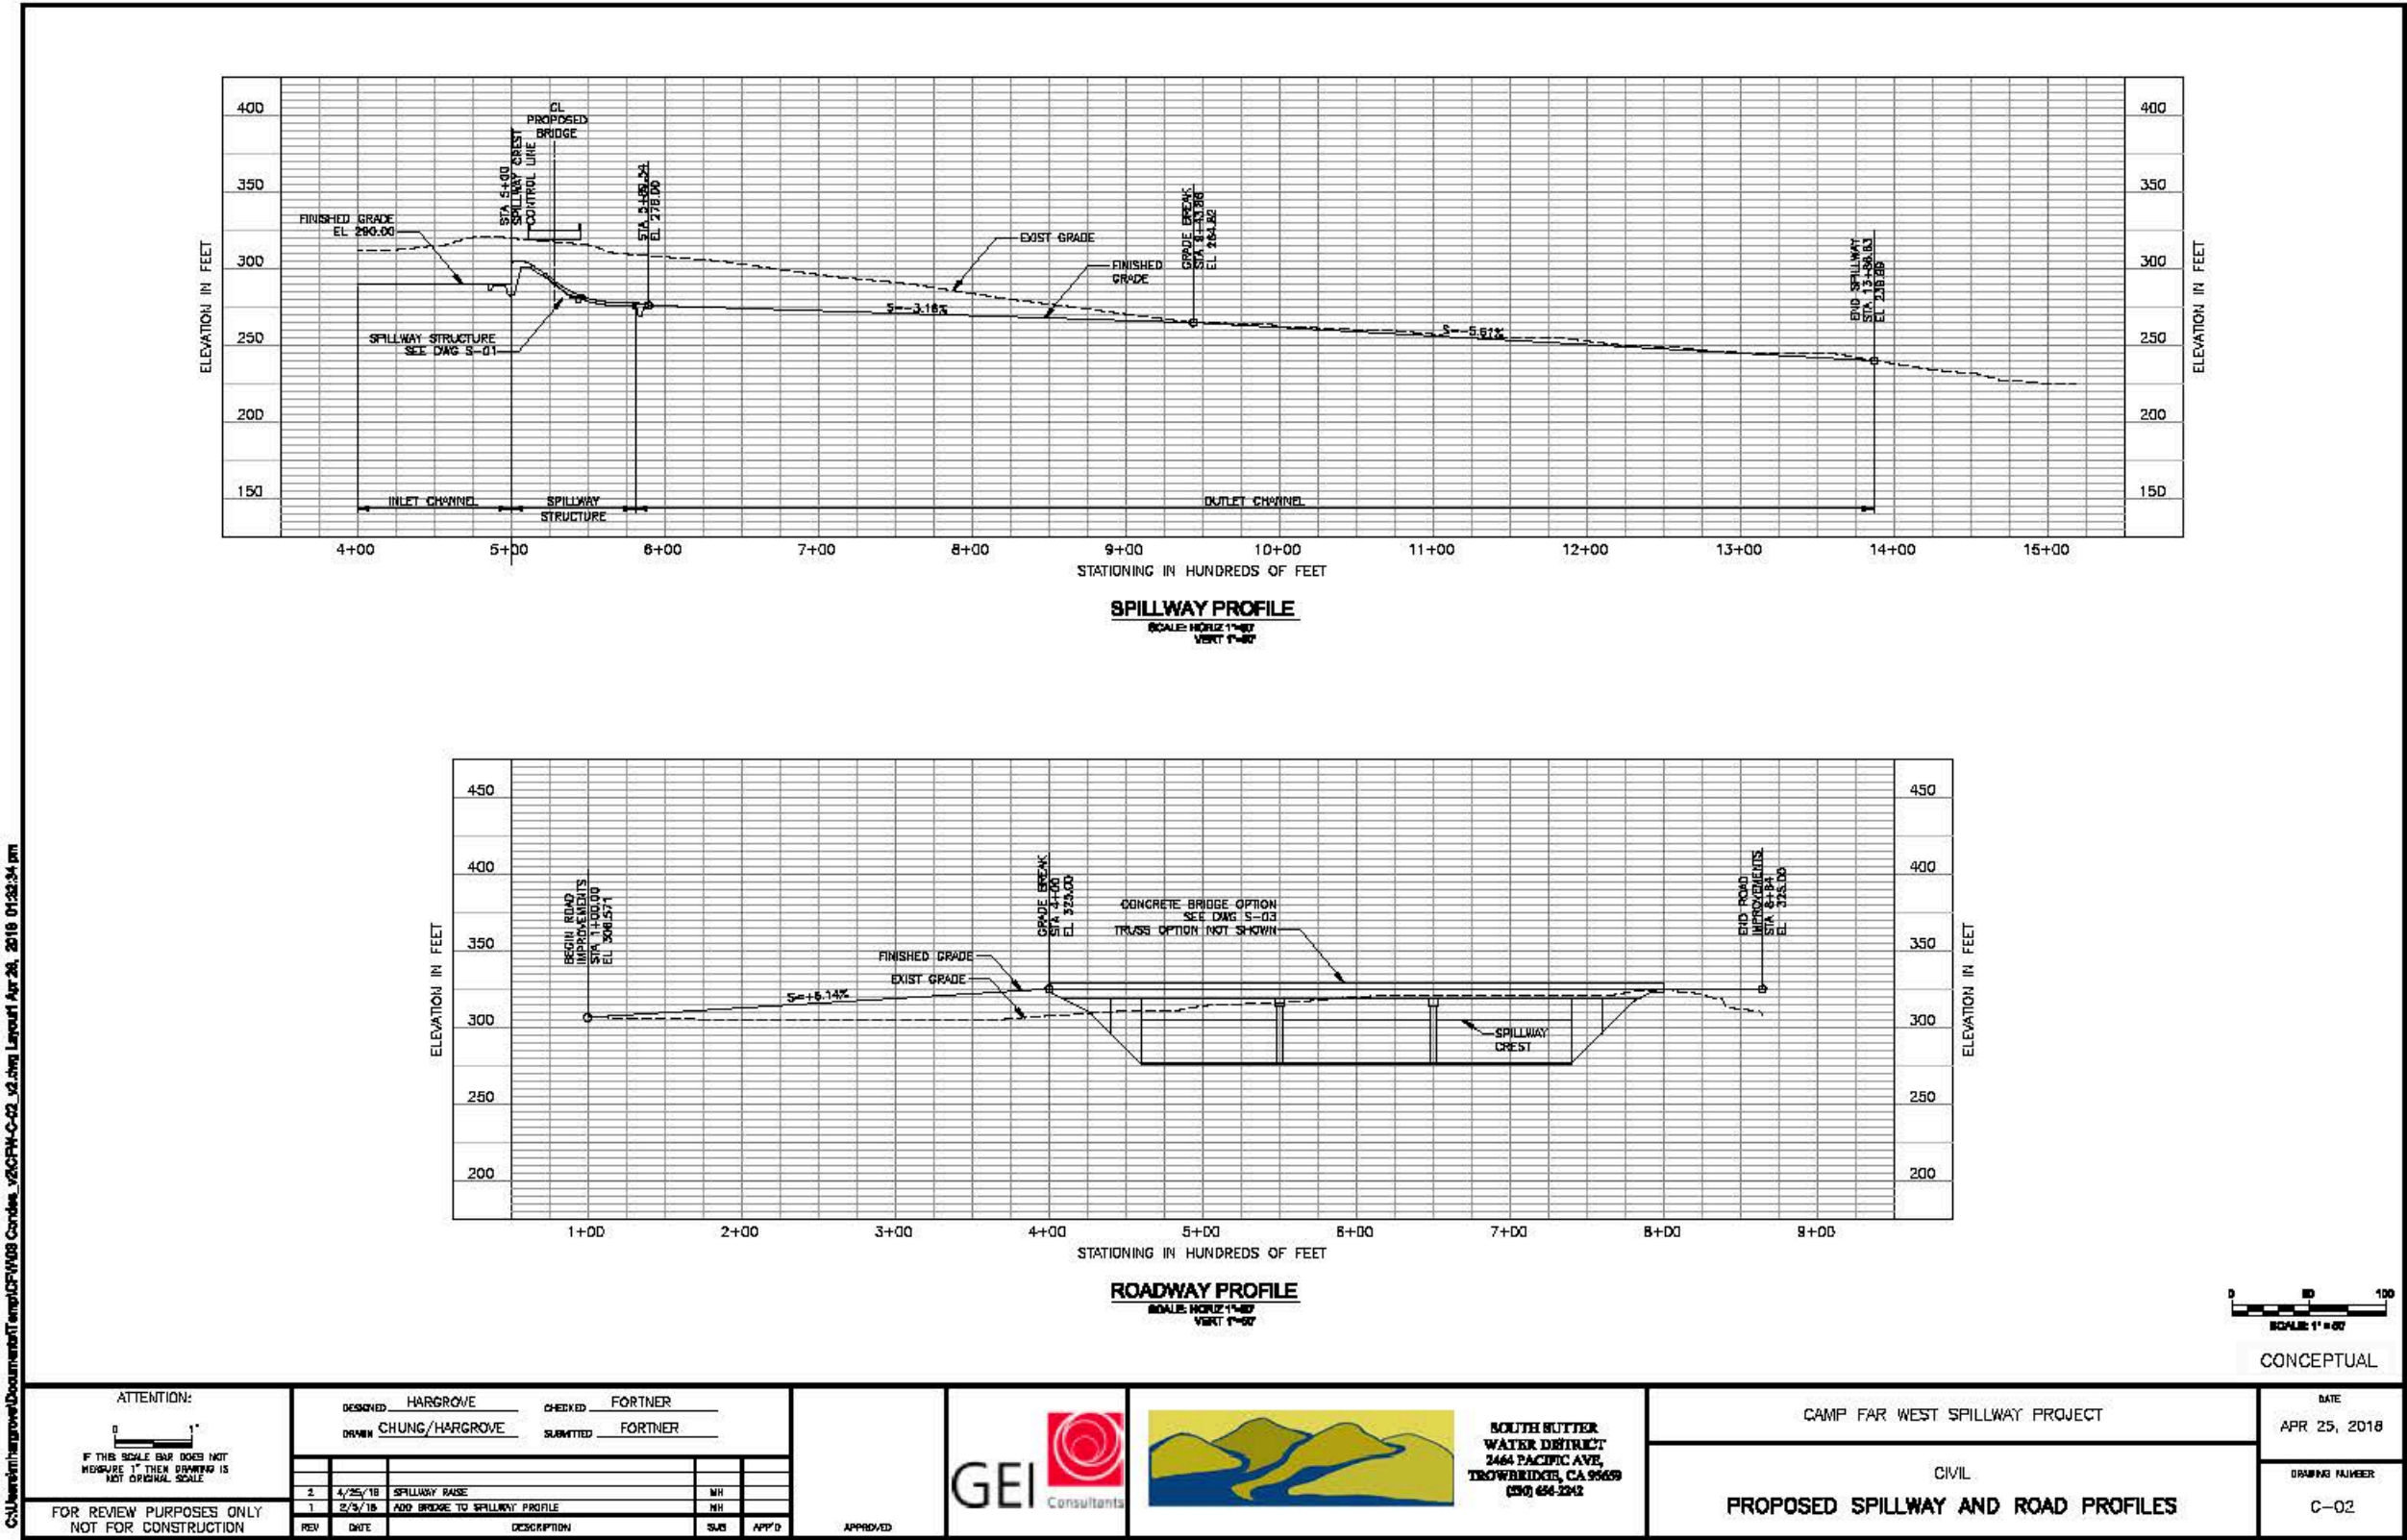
Conceptual level plan for Camp Far West Reservoir Pool Raise – spillway and road profiles.
